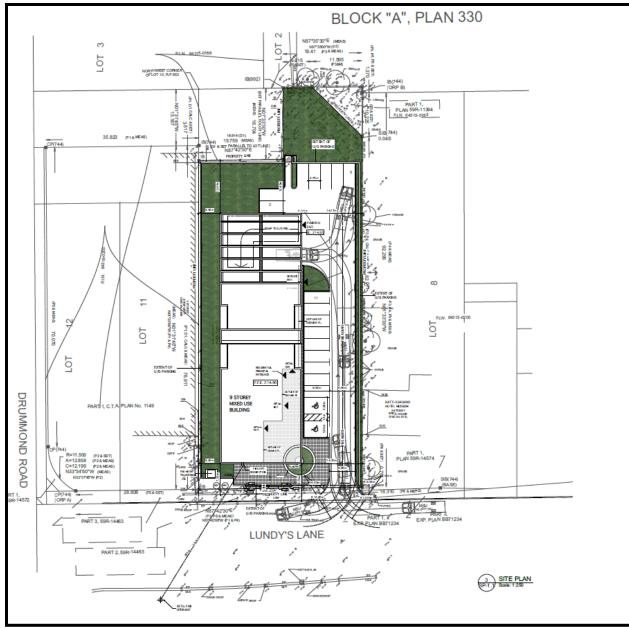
2023 Plan 6179 Lundy's Lane Proposed At-Grade Site Plan (MB1 Urban Planning 2023b)
